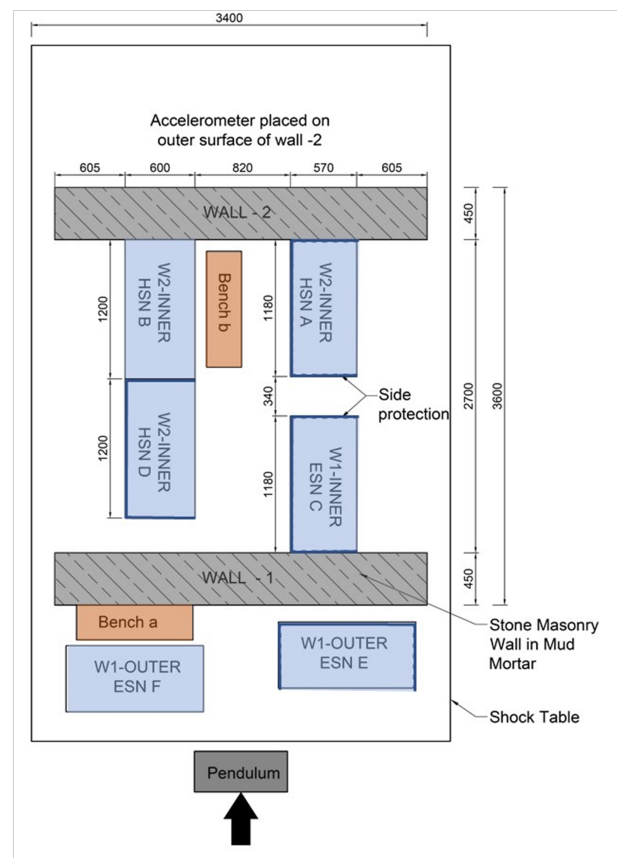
Building mock-up floor plan (note: dimensions are in mm)
